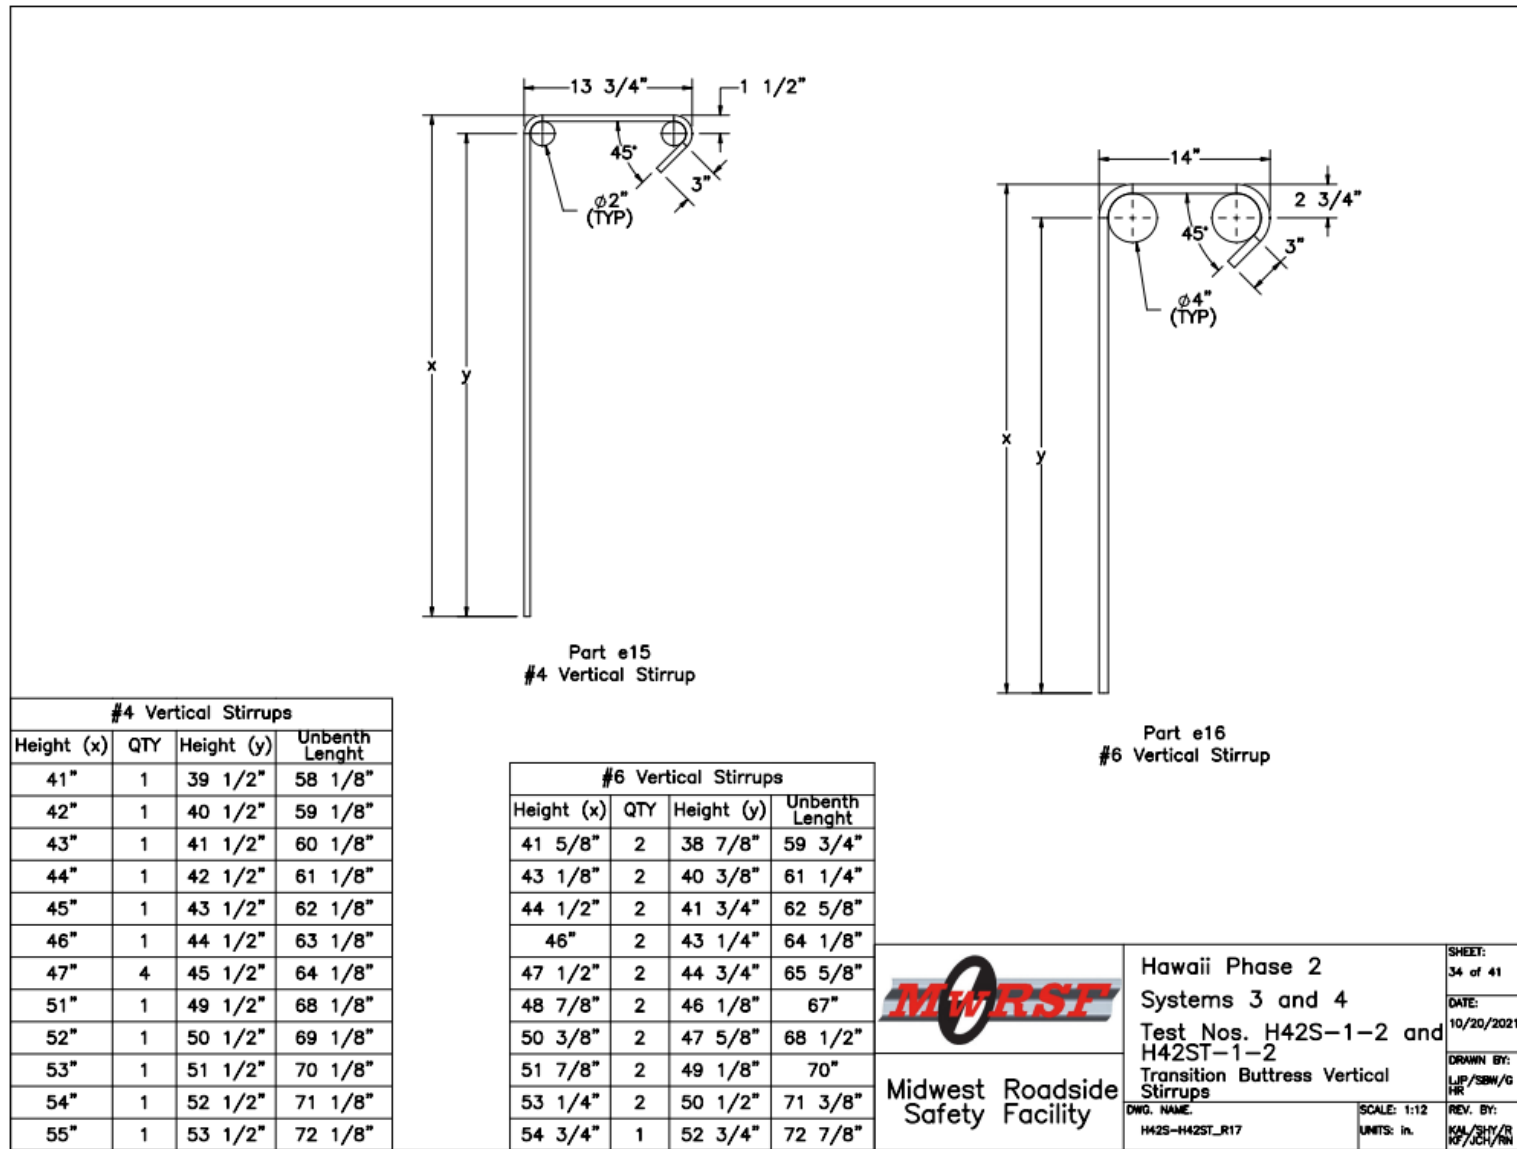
Transition Buttress Vertical Stirrups, Test Nos. H42ST-1 and H42ST-2
